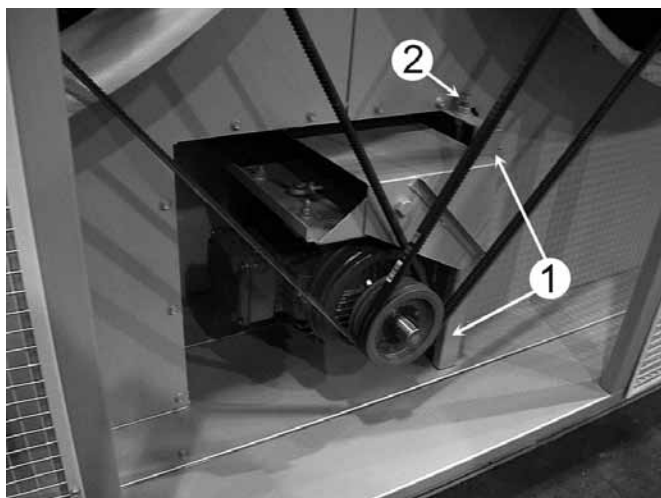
Adjustable Motor Base FXT – Multiple Fan
